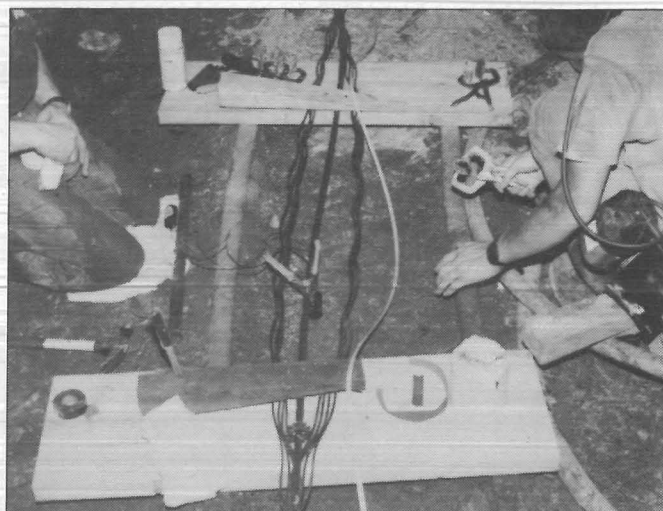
Strain gauge being placed on combined conventional and birdcage cable.
